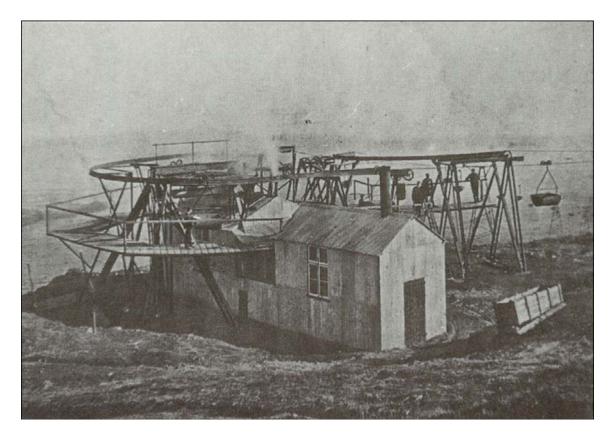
Ropeway driving station at the ropeway head (Photo courtesy of A Jenkins)
